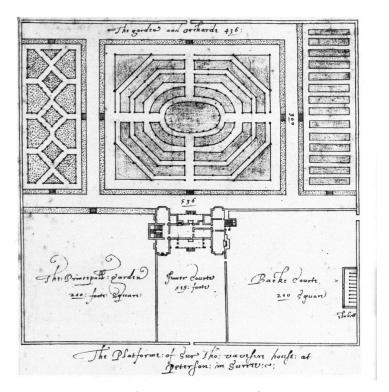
Plan of Ham House and Garden, attributed to John Smythson, c. 1609, RIBA Drawings, V and A, London.
